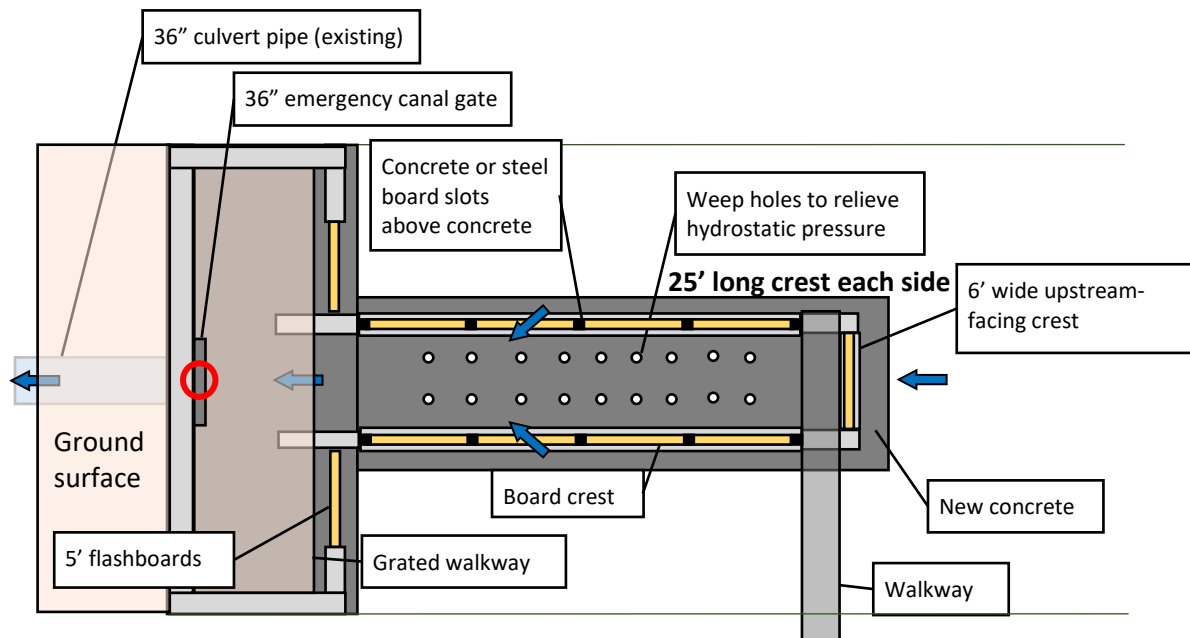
Conceptual plan view of example LCW structure to be constructed to replace the existing flashboards just downstream of the new flow control structure (not to scale)
